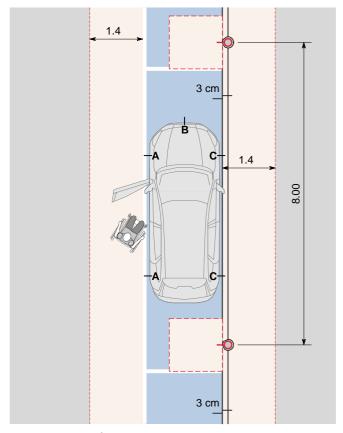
Parking field arrangement along the roadway, access to the sidewalk by means of punctual access ramp
